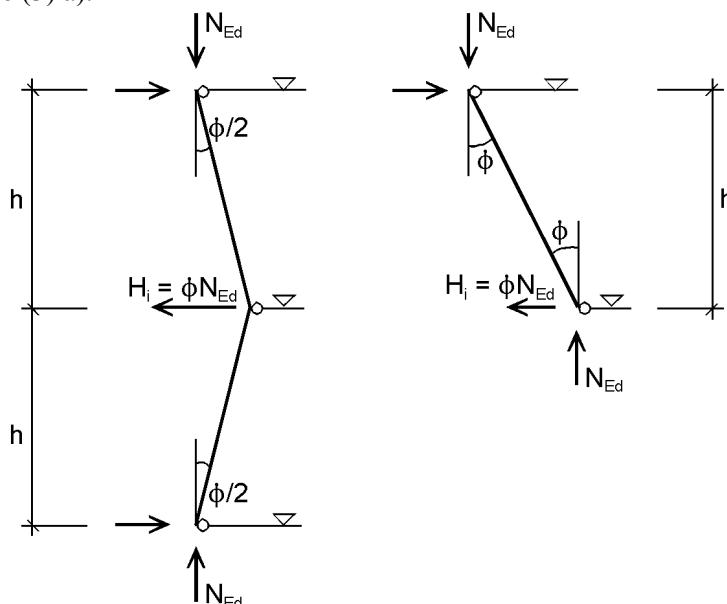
Configuration of sway imperfections ϕ for horizontal forces on floor diaphragms
